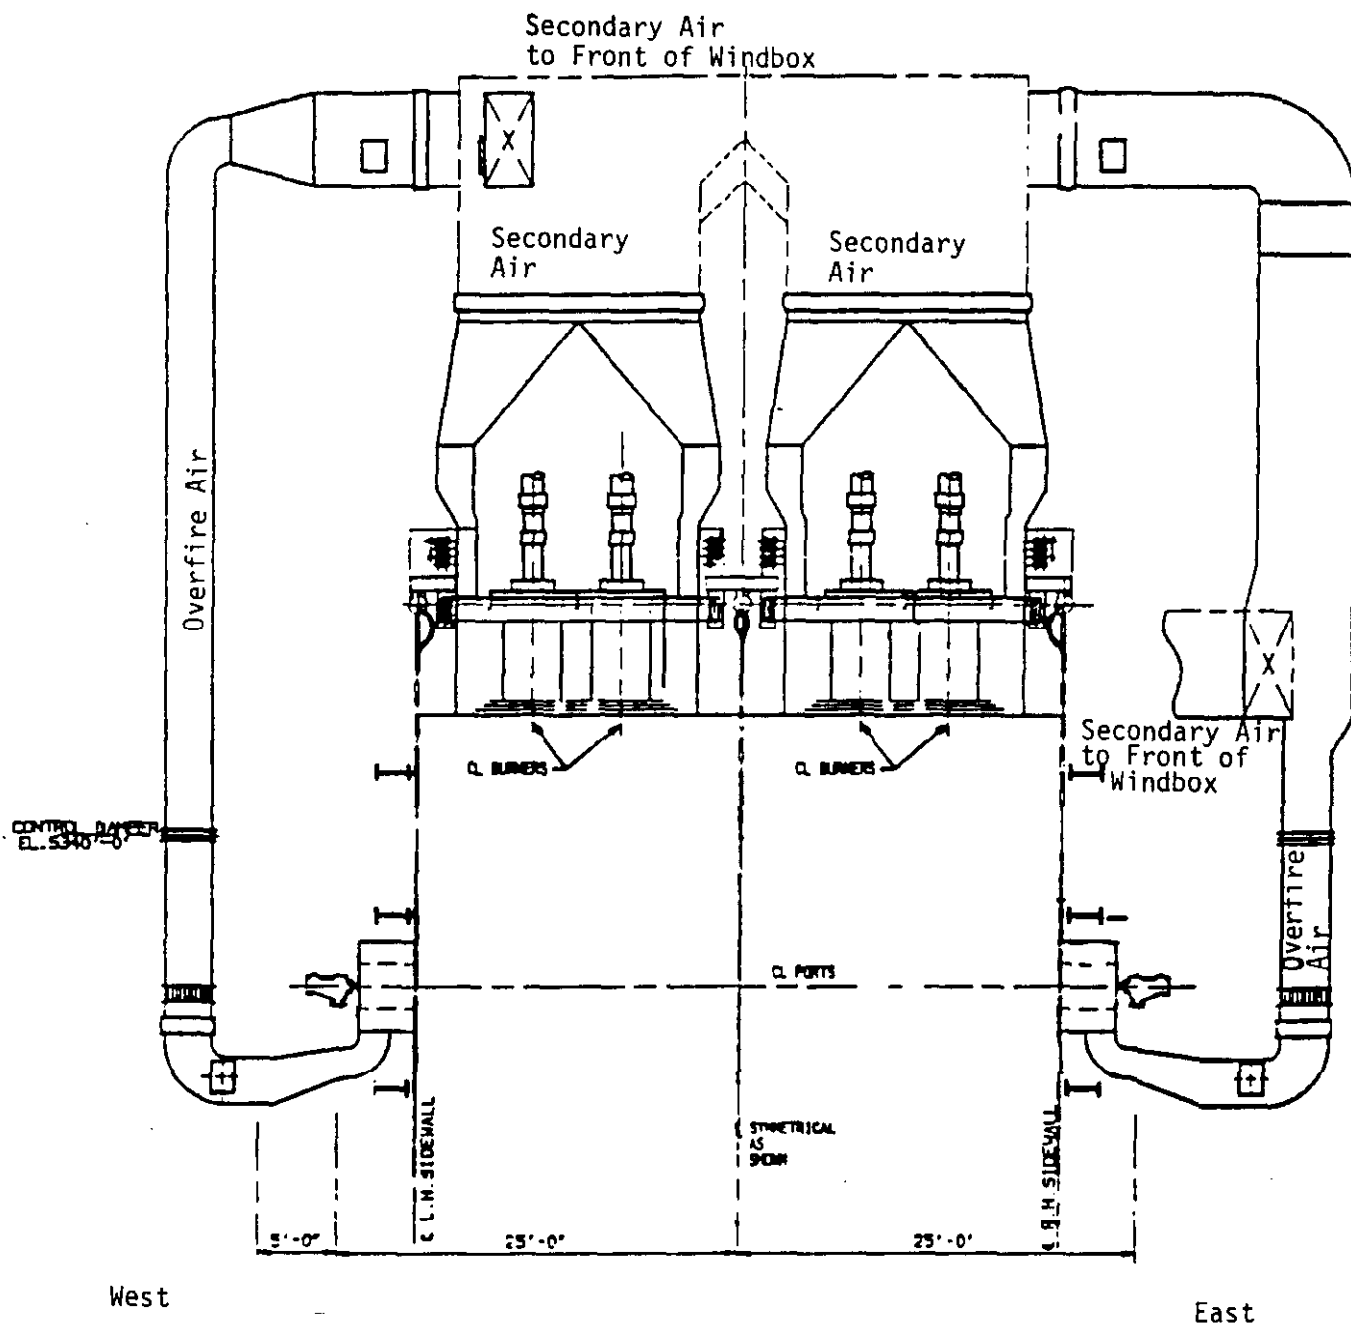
Plan View of Burner Arrangement after Retrofit
